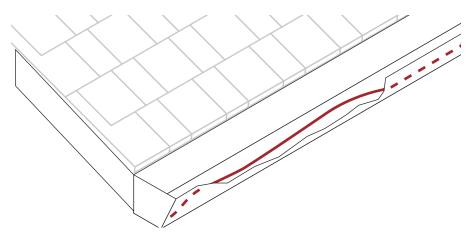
Layout in standard gutters — up to 6" (16 cm) wide
